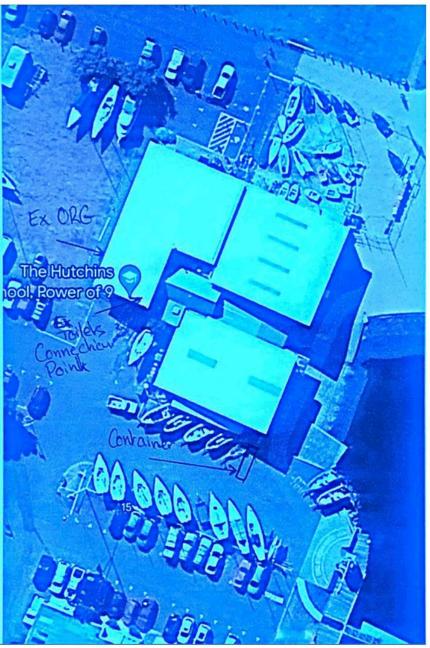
above: submitted site plan showing position of proposed container(new building for food service use).
